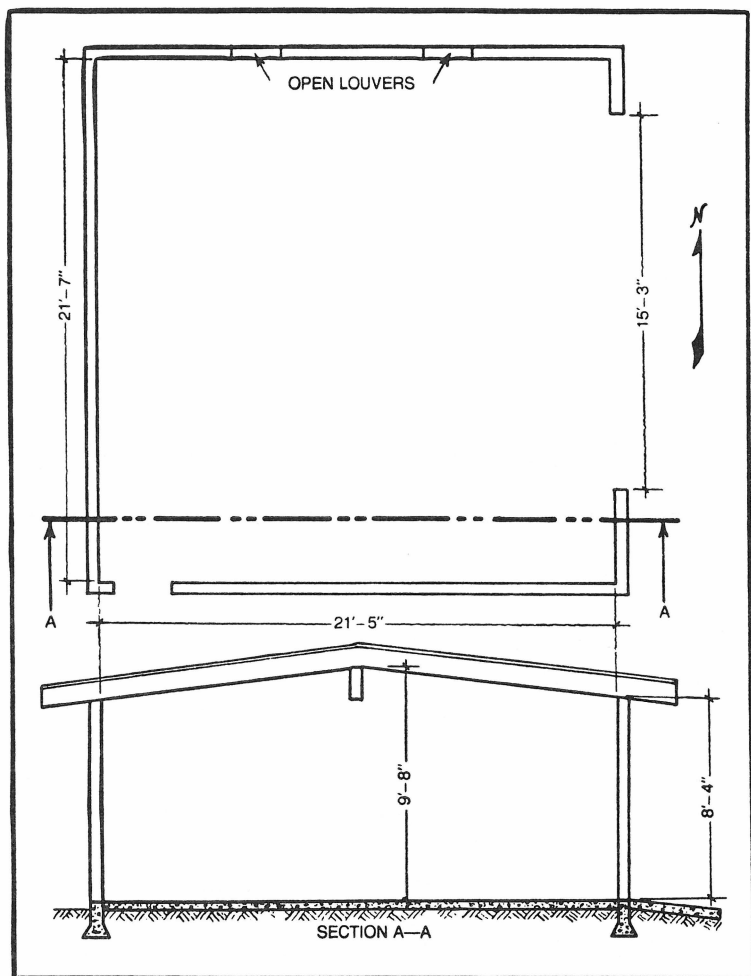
Plan and sectional views of garage before its conversion to a multitrack recording studio.
